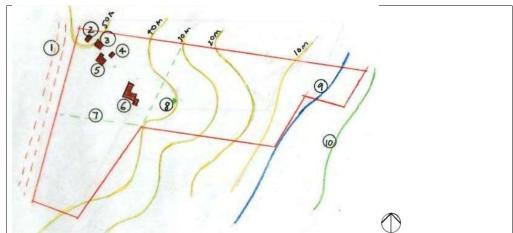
Site plan of the Mount Omei property, drawn by Geoff Ashley, 2016. Key: 1) Leacocks Lane entrance to Mount Omei 2) 1959 Garage 3) 1946 Garage/studio 4) 1960 Workshop 5) 1946 Former laboratory-gallery 6) 1947-48 House 7) Fencing around house precinct 8) Pond overlooking slopes 9) Glenfield Creek 10) Path/cycleway (Ashley, 2016, p25 and Annexure A).
